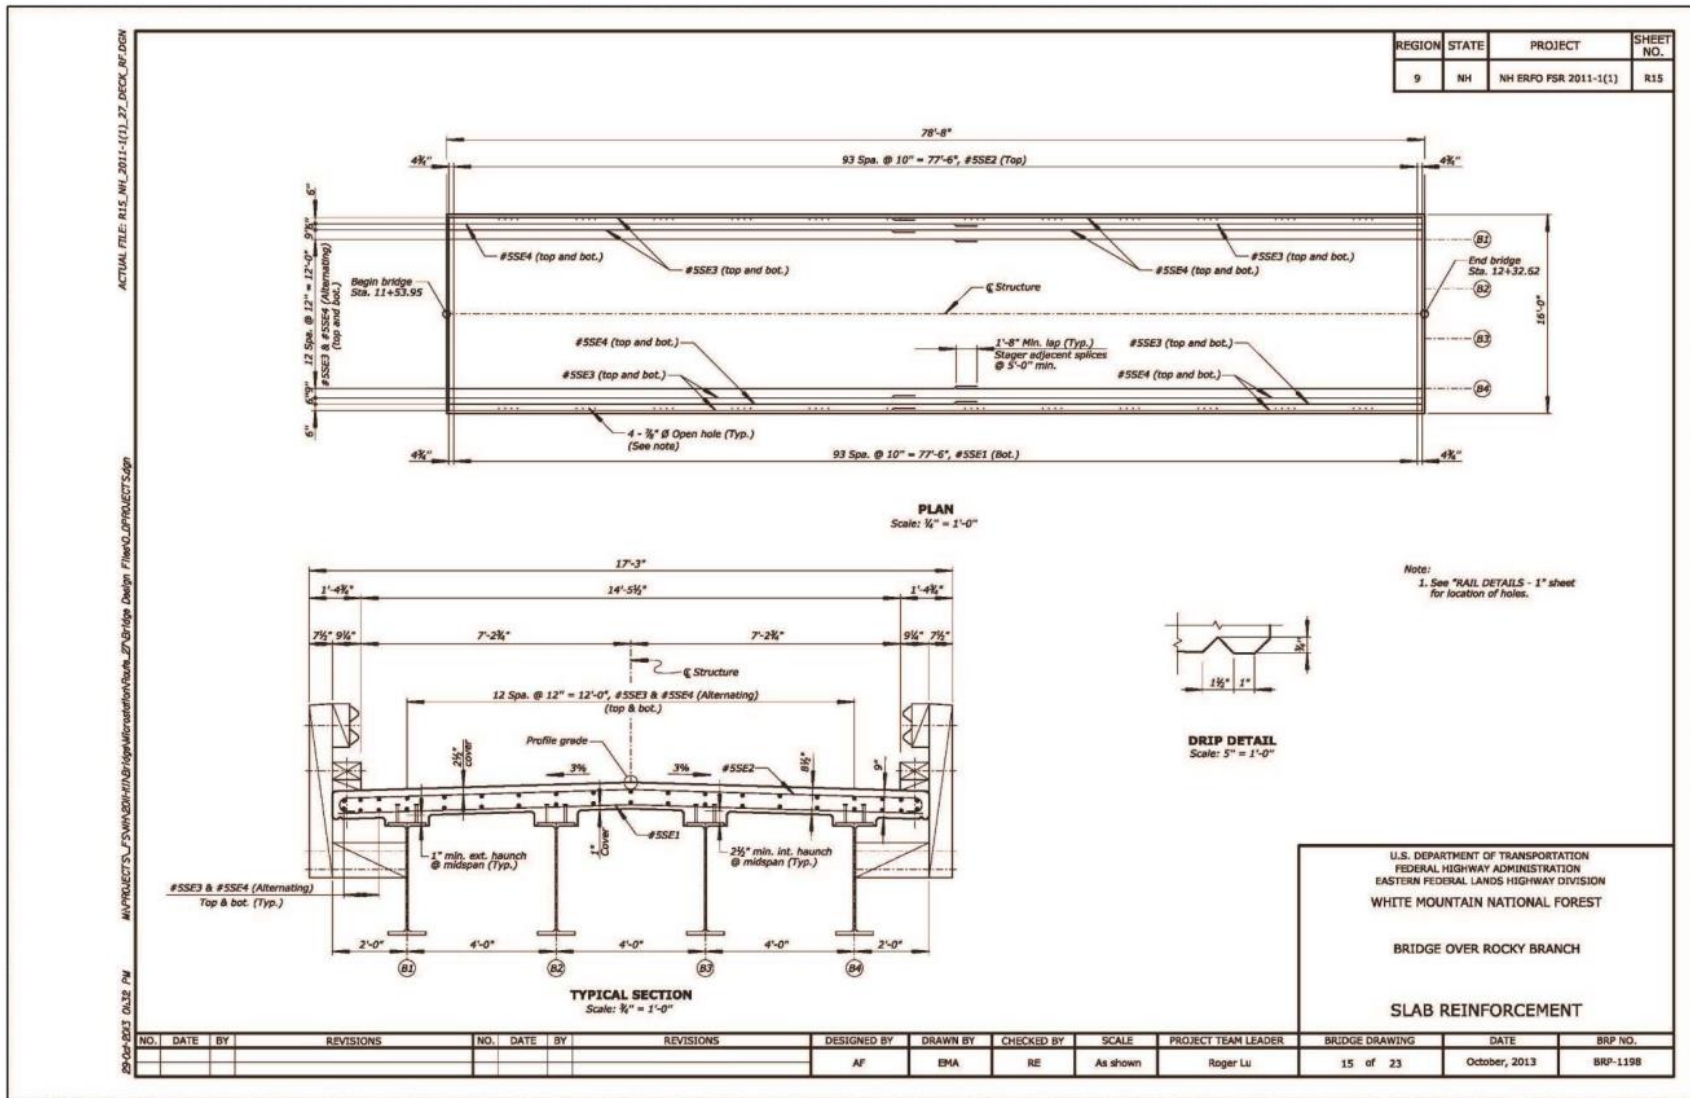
White Mountain National Forest Bridge Deck Design Drawings [8]
